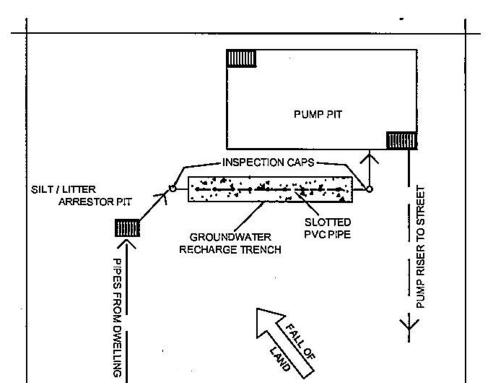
Example Groundwater Recharge Trench Layout - Fall to a Pump at the Rear
